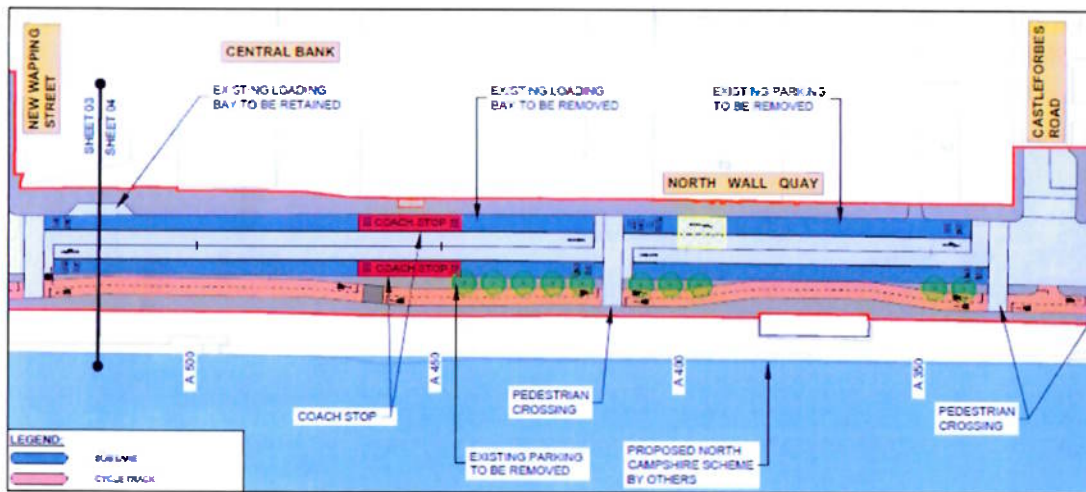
Extract from General Arrangement Drawing Sheet 4 Part 1 North
